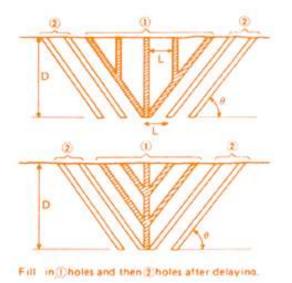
TRENCHING AND TUNNELING OF ROCK
